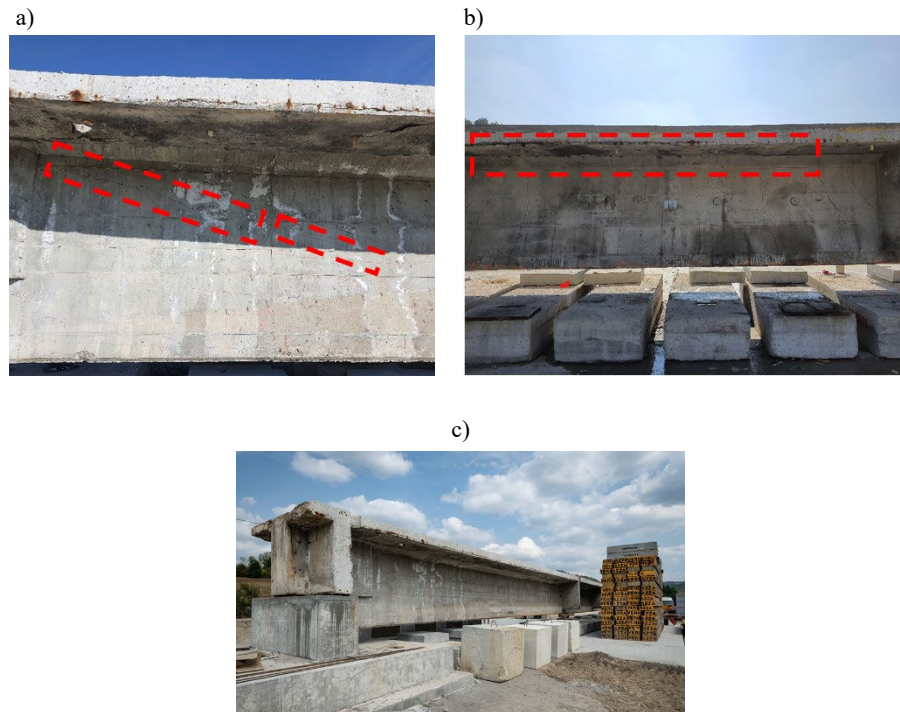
Cracking along the longitudinal direction near the path of post-tensioning tendons close to the anchorages. (a). Longitudinal cracking of the slab (b). General view of the beam (c).
